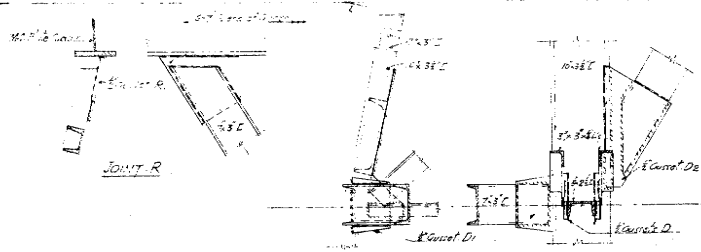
DETAILS OF BRACING TO PLATE GIRDERS ETC.
